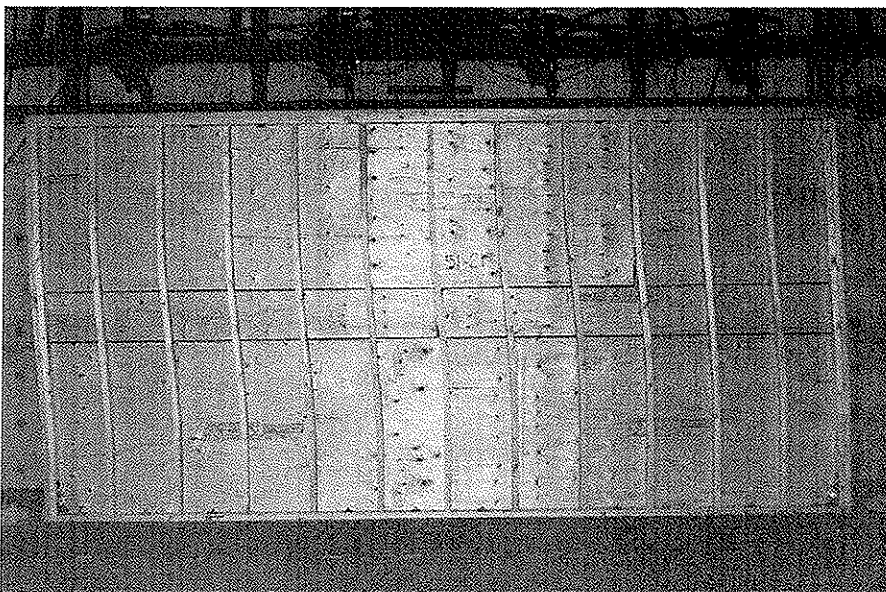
Deformed shape of unblocked shear walls under wall configuration 2.
